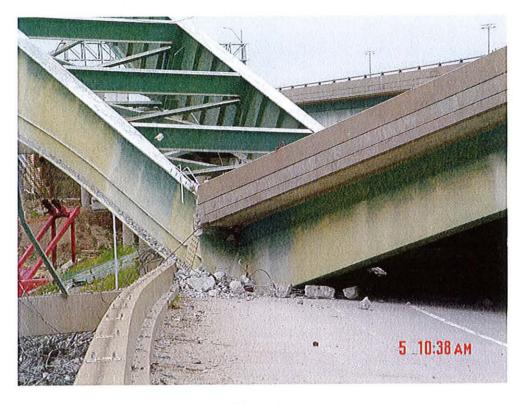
(Looking north, V-shape collapse of bridge girder span between bent no. 2 & 3)
